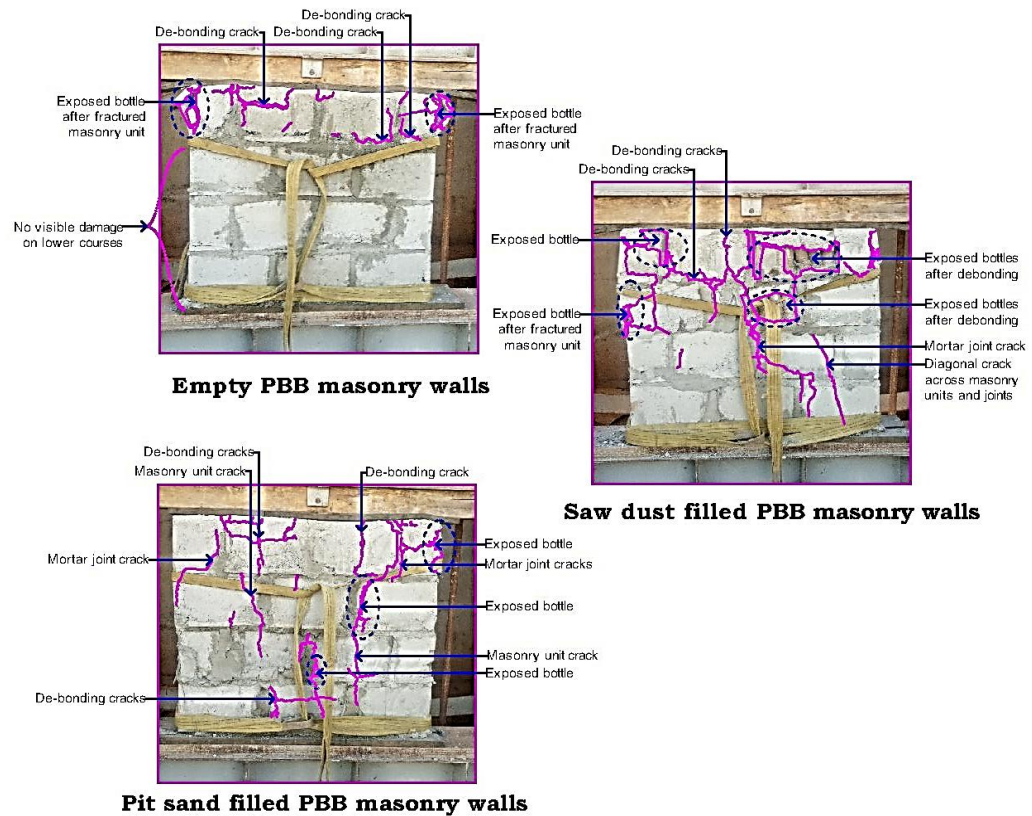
Crack propagation for PBB masonry walls at peak load.
